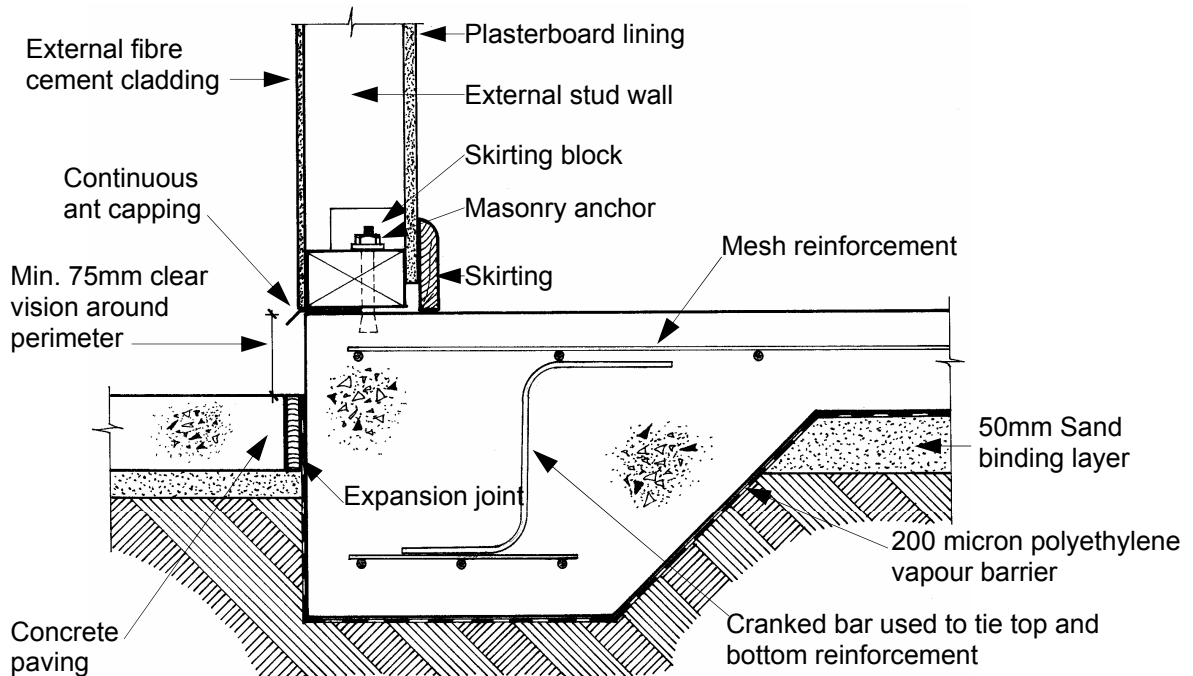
Slab-on-ground with thickened edge beam (timber frame)
